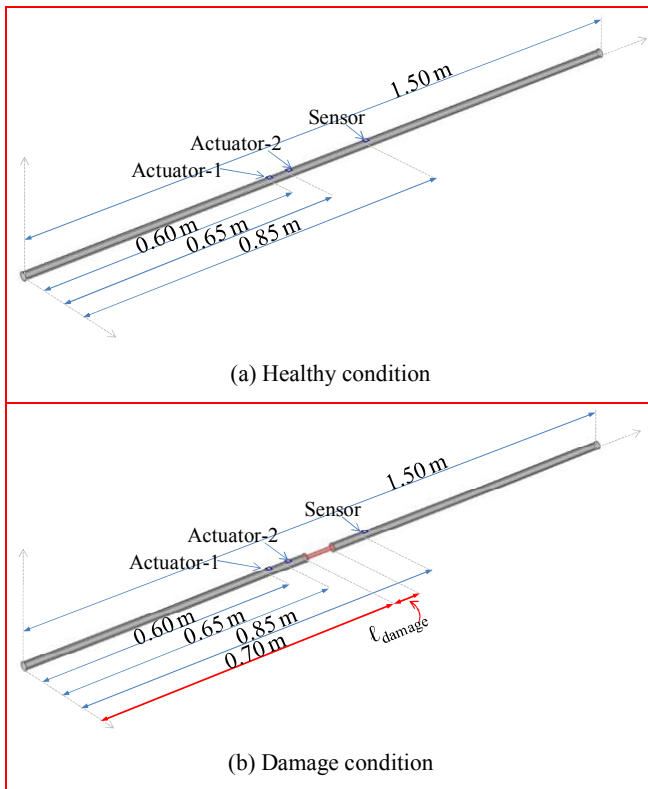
Concrete reinforcement, geometry and location of the PZT patches and damage location
